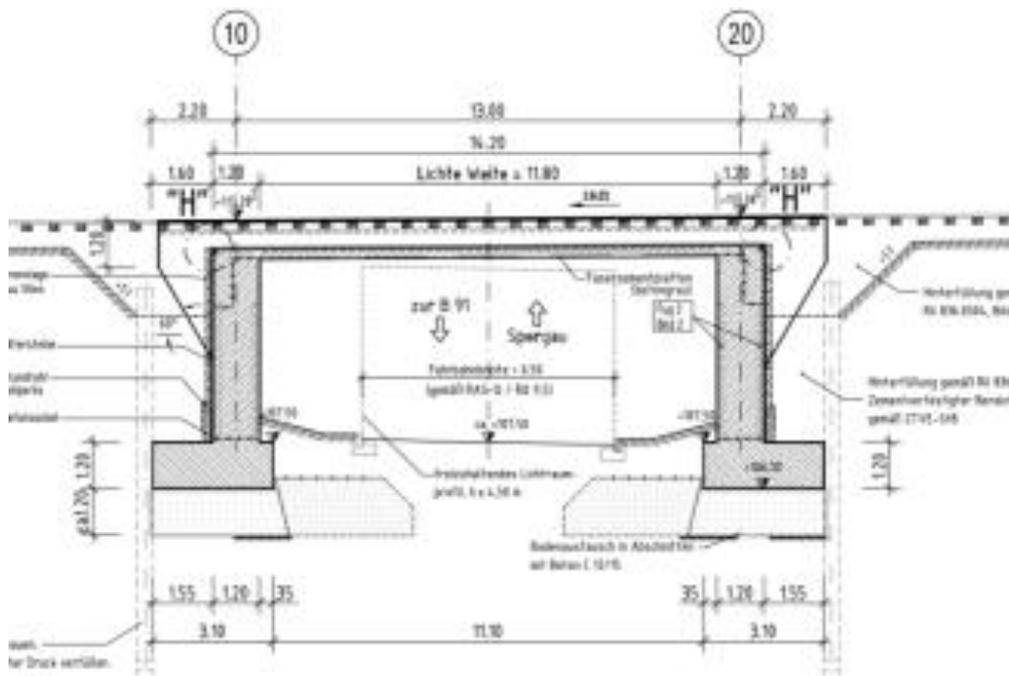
Longitudinal section railway crossing over K2174 (Maienweg) in Leuna
